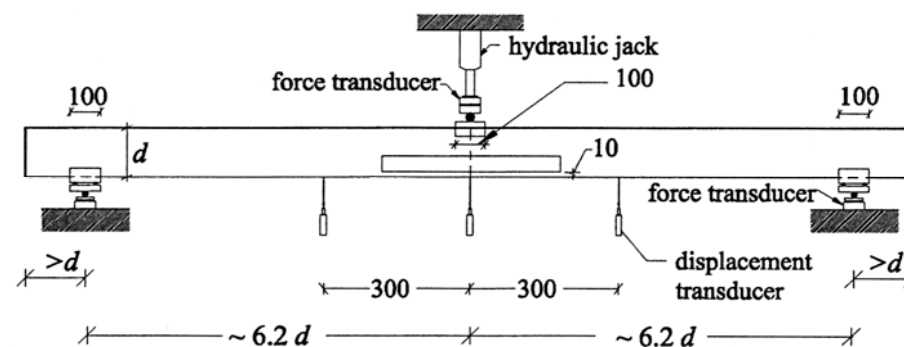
Test arrangement for beams in 3-point bending. Dimensions in mm.
